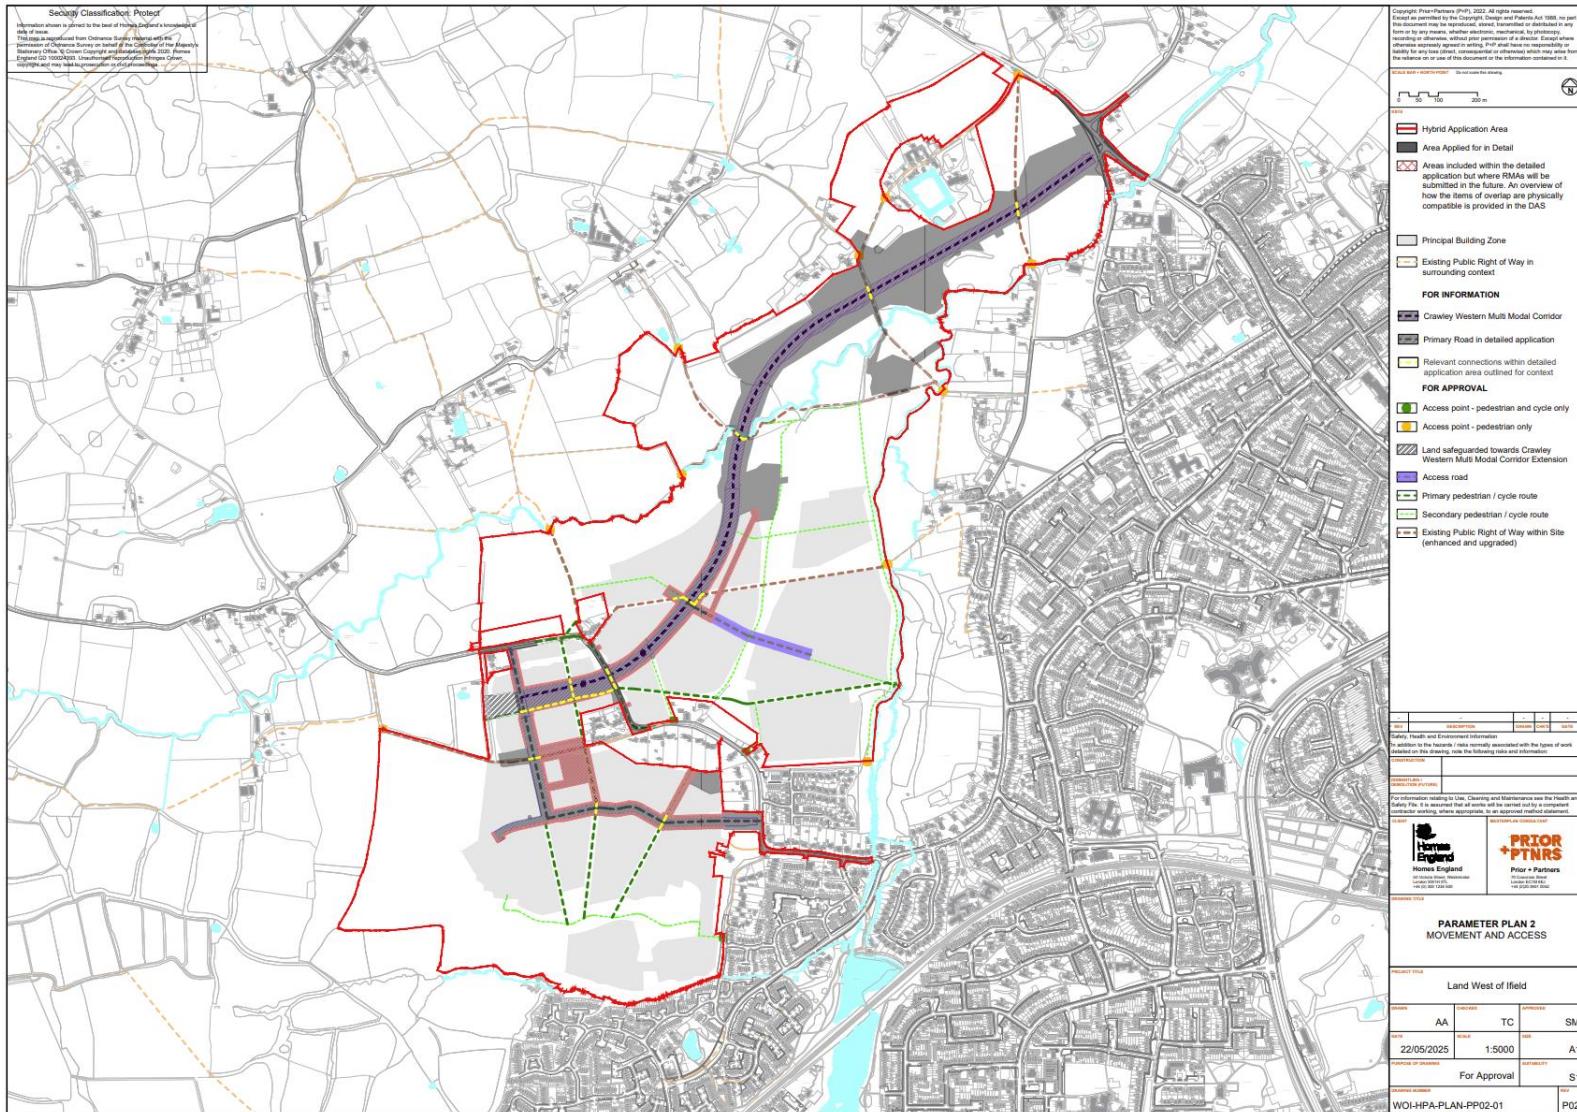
Movement and Access Parameter Plan (Parameter Plan 2: Movement and Access, WOI-HPA-PLAN-PP02-01)
